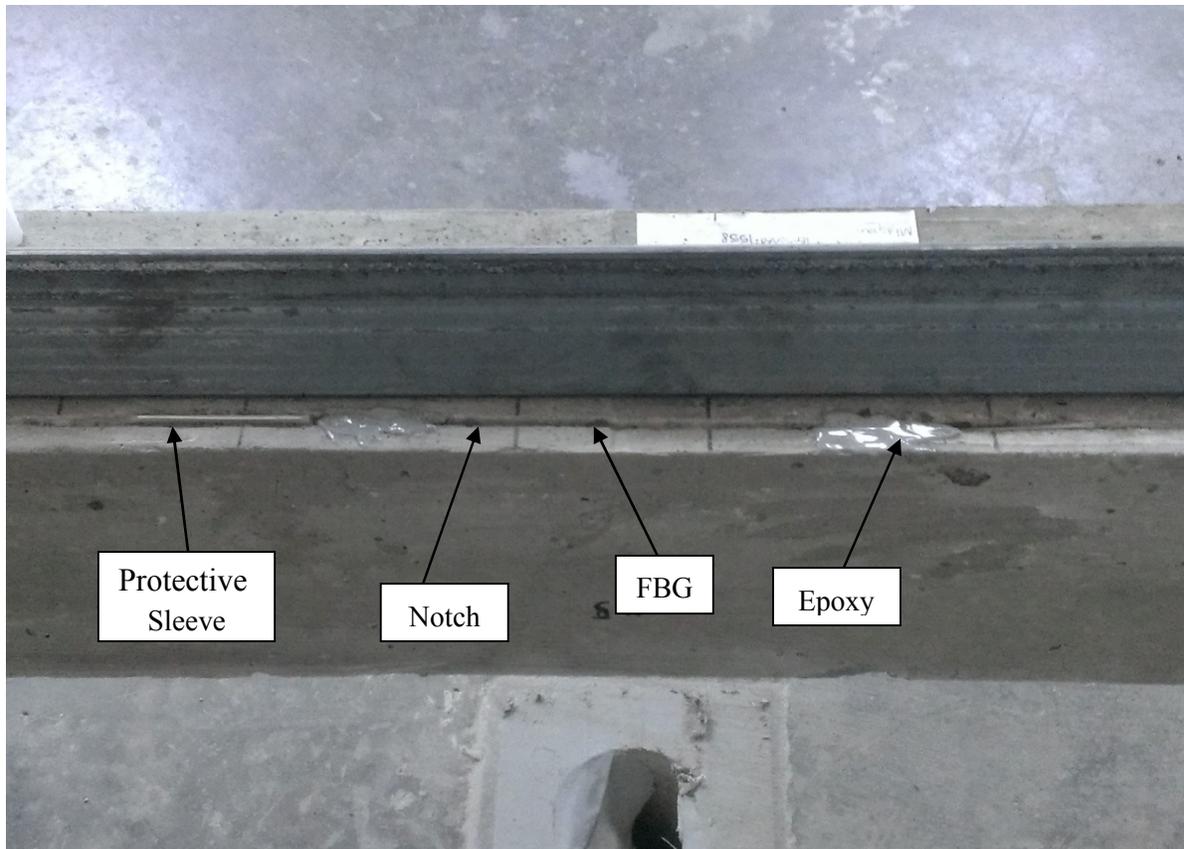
Photo of Long-Gage FBG Installed on Concrete Beam
